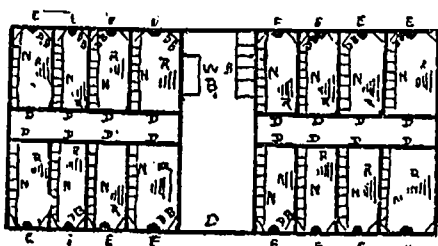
, ground plan, shows the location of pens, and will enable one to properly construct his house to meet the requirements of the flock.
